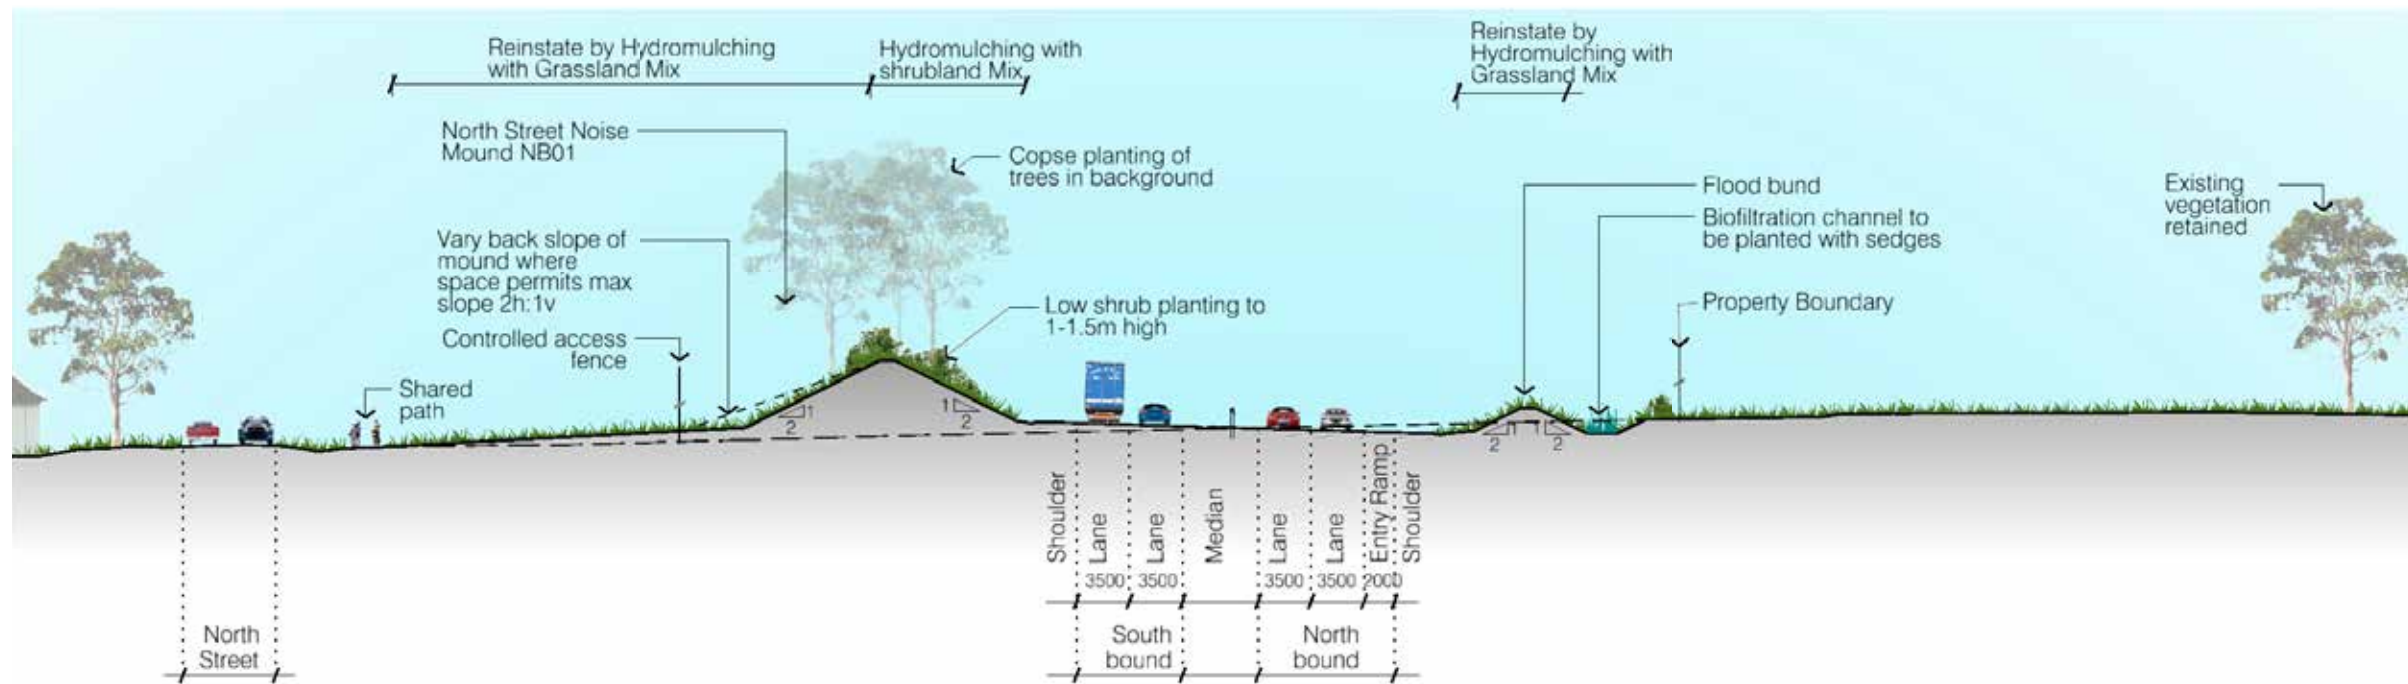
Road cross section at Ch. 16900 (Scale 1:500 @ A3)
